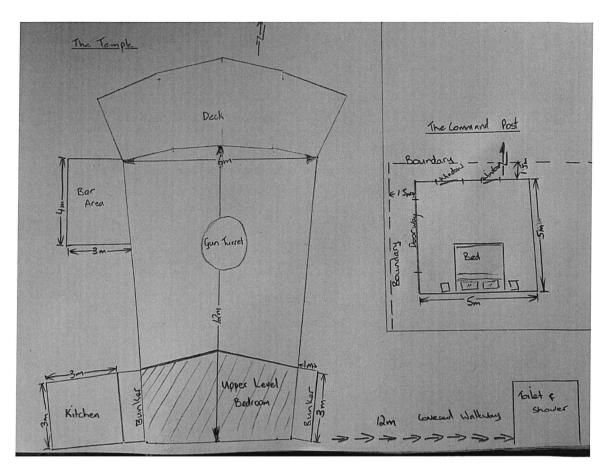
Figure G - Phase 1A: Dwelling House (Indicative Sketch) – Existing Building Work
